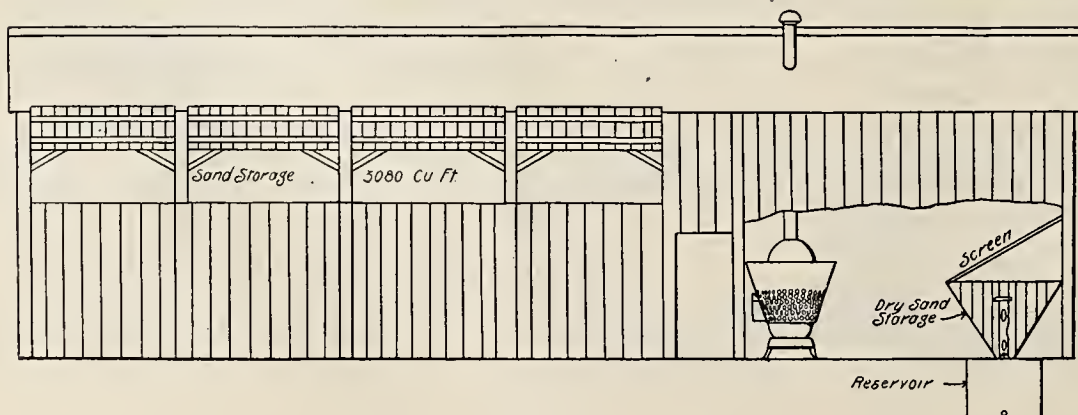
VANDALIA RAILROAD SAND HOUSE AT TERRE HAUTE.
